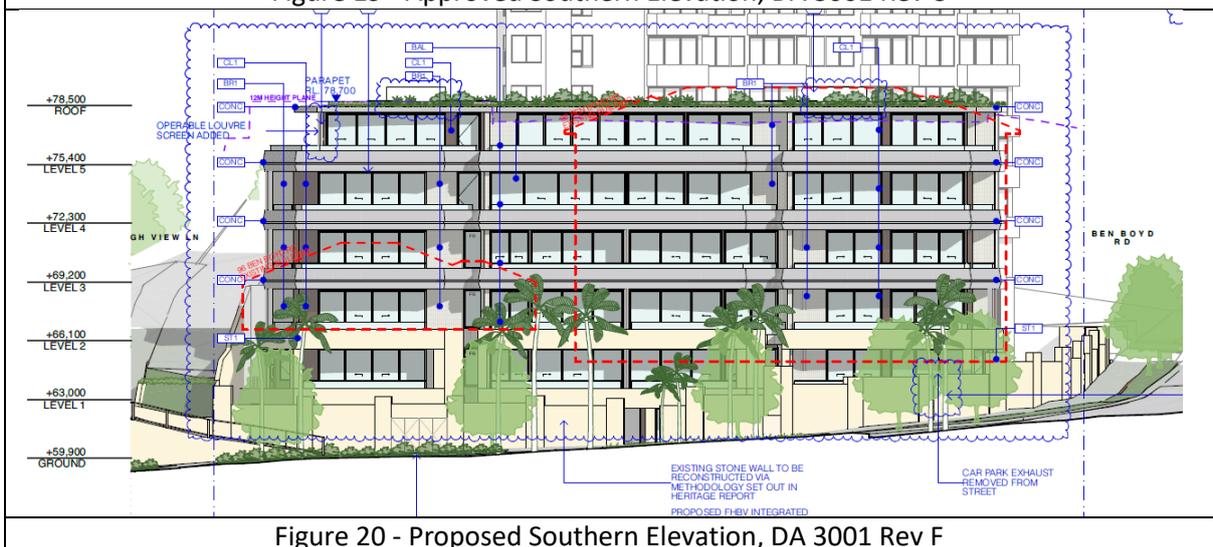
Proposed Southern Elevation, DA 3001 Rev F
